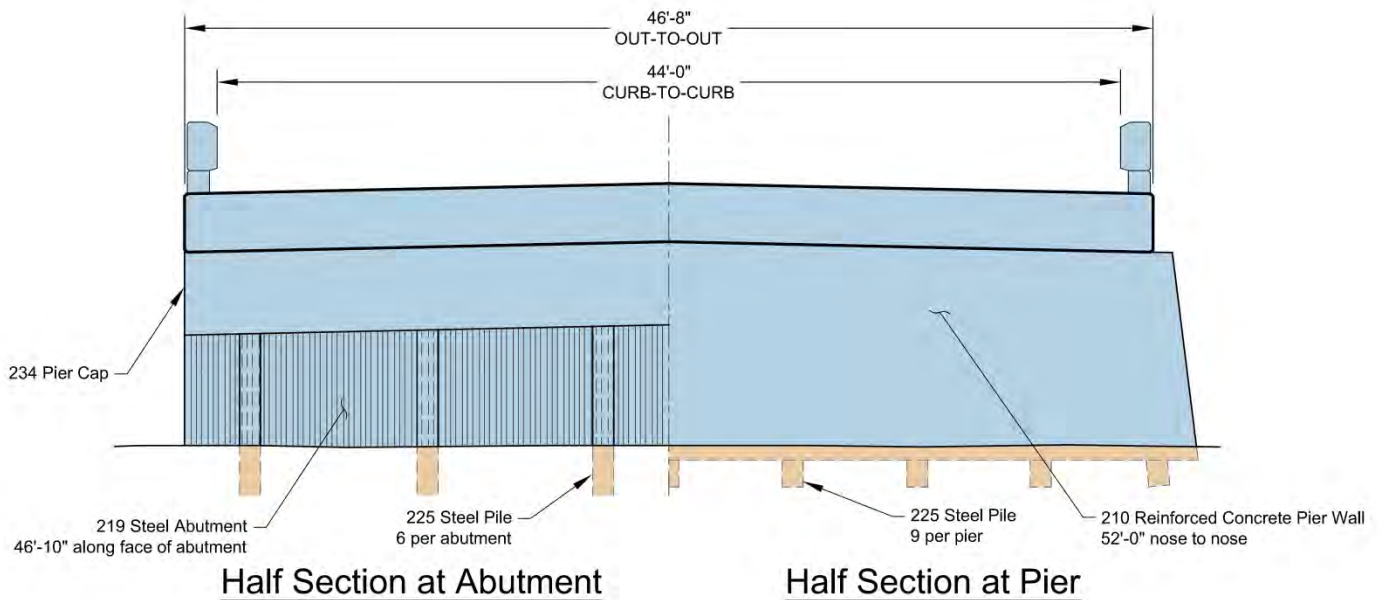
EI.24.3-3: Cross section view of continuous concrete slab superstructure
